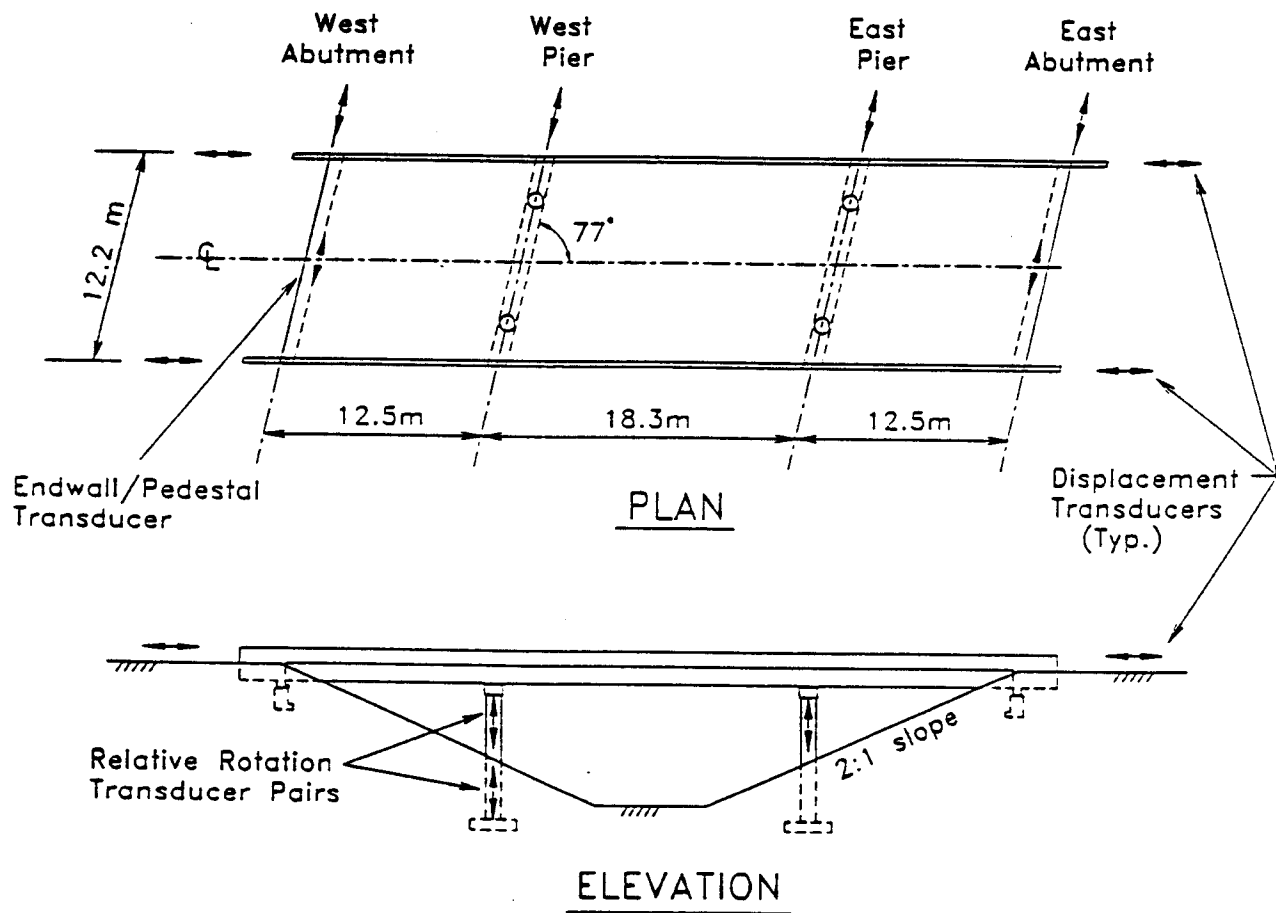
The Plan and Elevation of the Bridge (Eberhard and Marsh, 1995)
